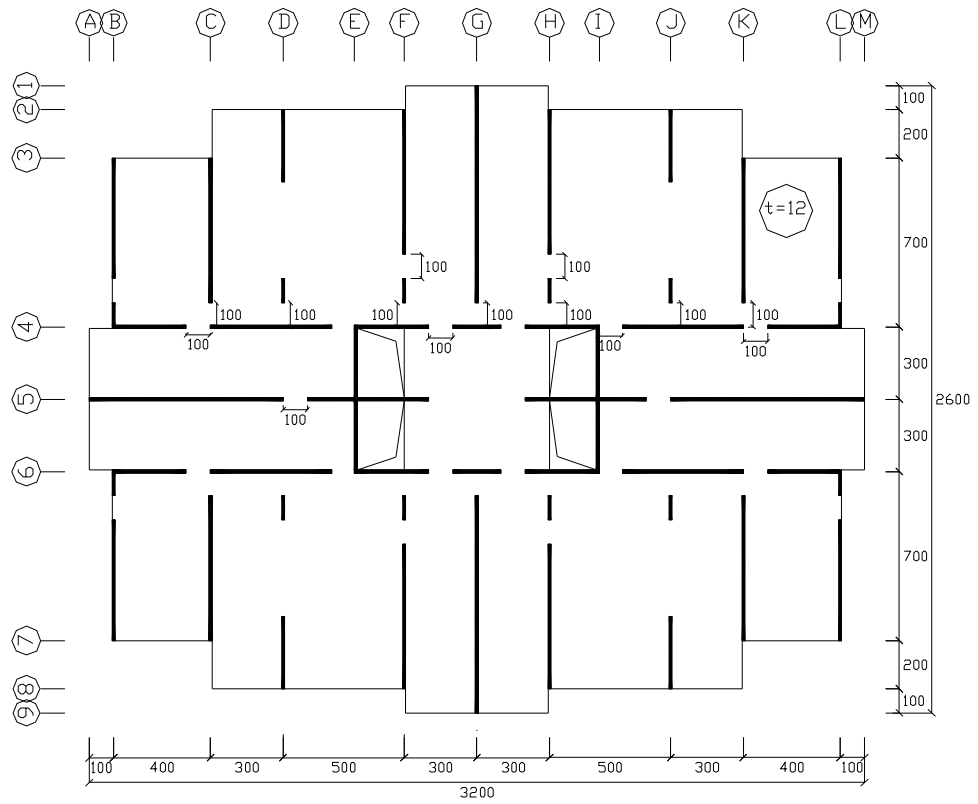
Typical plan view – Plan No. 16 (units in cm)
